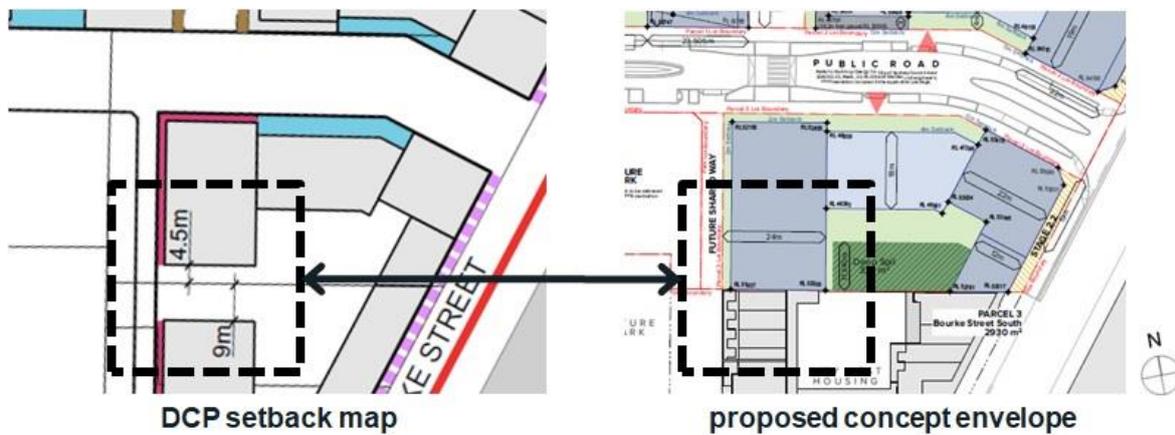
Comparison of DCP prescribed setbacks and proposed nil-setback to southern boundary of (Parcel 3) Lot 103 and the adjacent City West Housing site
